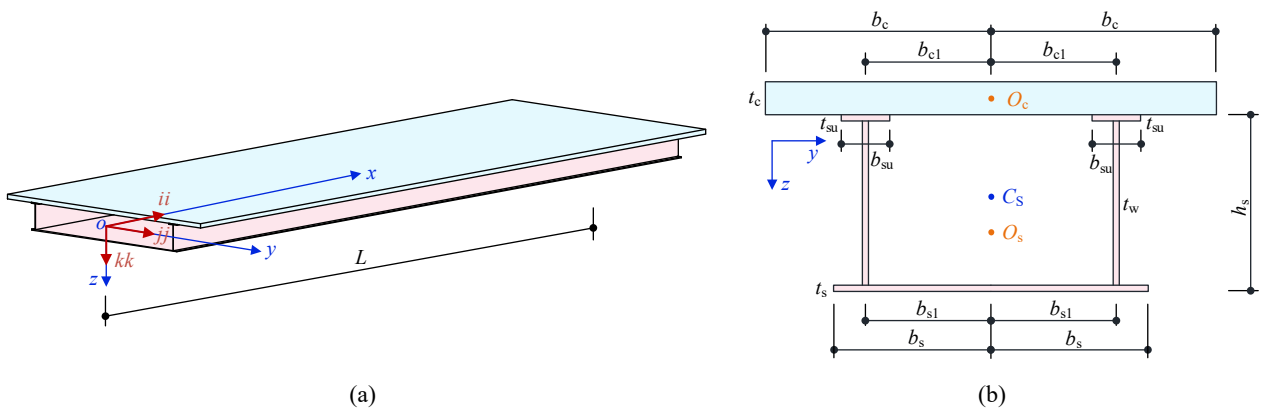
Diagrams of steel-concrete composite box-girder bridges [33] (a) Three-dimension; (b) Cross-section.
